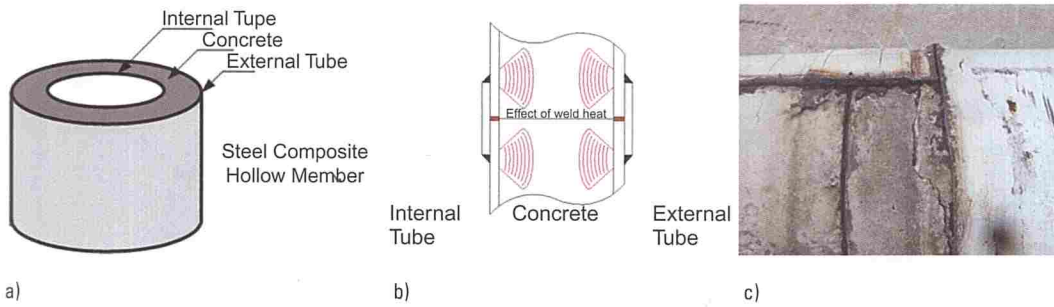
Section and module connections for steel composite hollow columns: a) section through column, b) connection method for modules, and c) cracks in concrete
